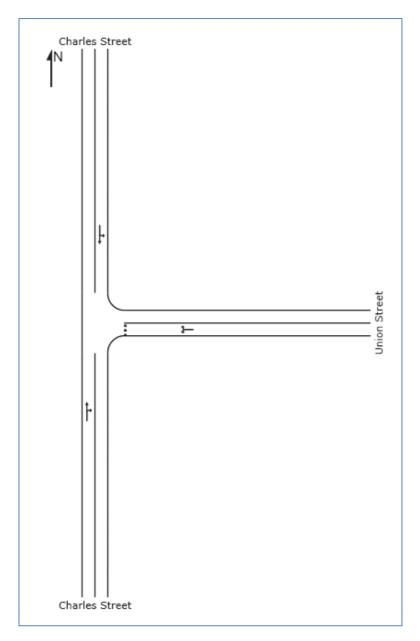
Existing Charles Street/Union Street Intersection Layout
